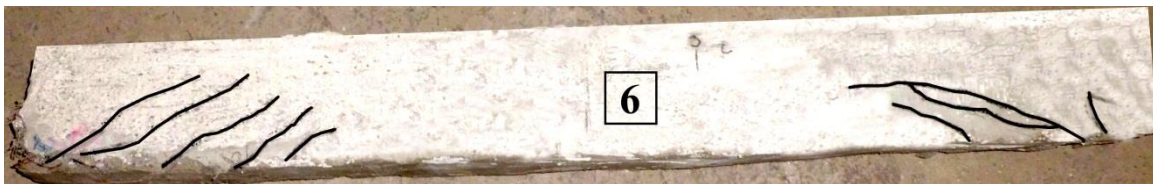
Cracking pattern of beam 3 Repaired.
